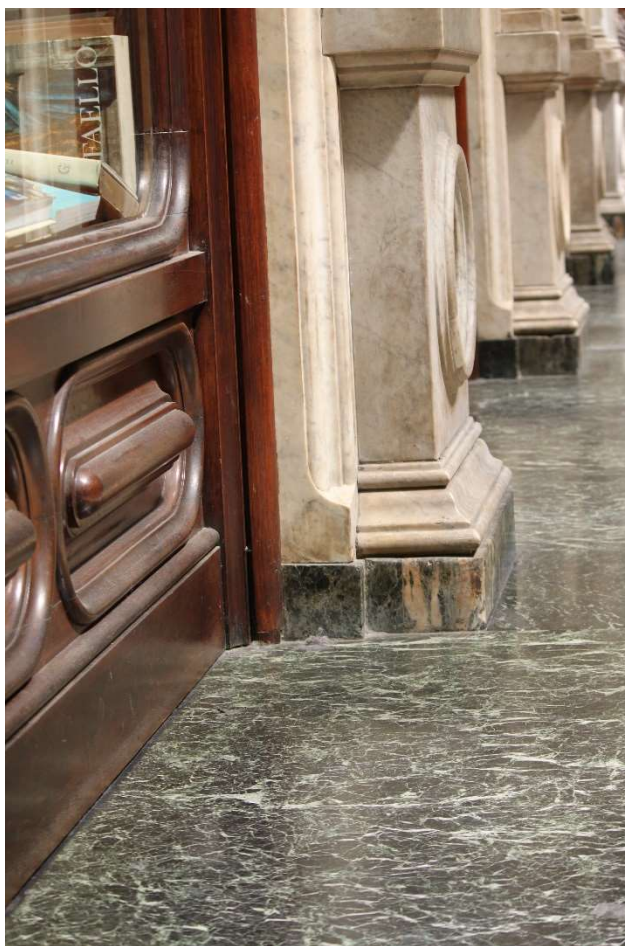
Detail of pavement of Sudalpina Gallery made up of *Verde Alpi Cesana*.
